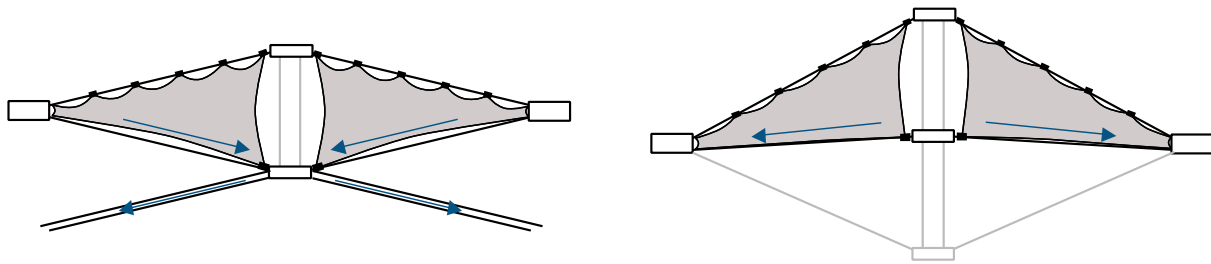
Two possibilities for a drain path, if valley line of the roof surface is sloping down toward the centre of the roof (Left: adding pipes for draining off rainwater, Right: changing the geometry with additional radial cables)
